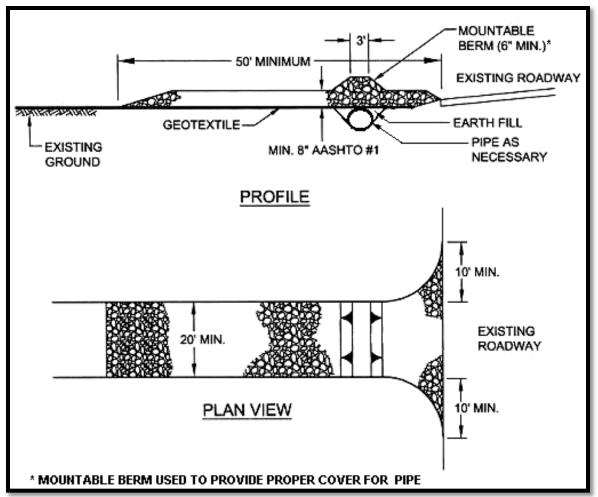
Standard Construction Detail of Rock Construction Entrance
